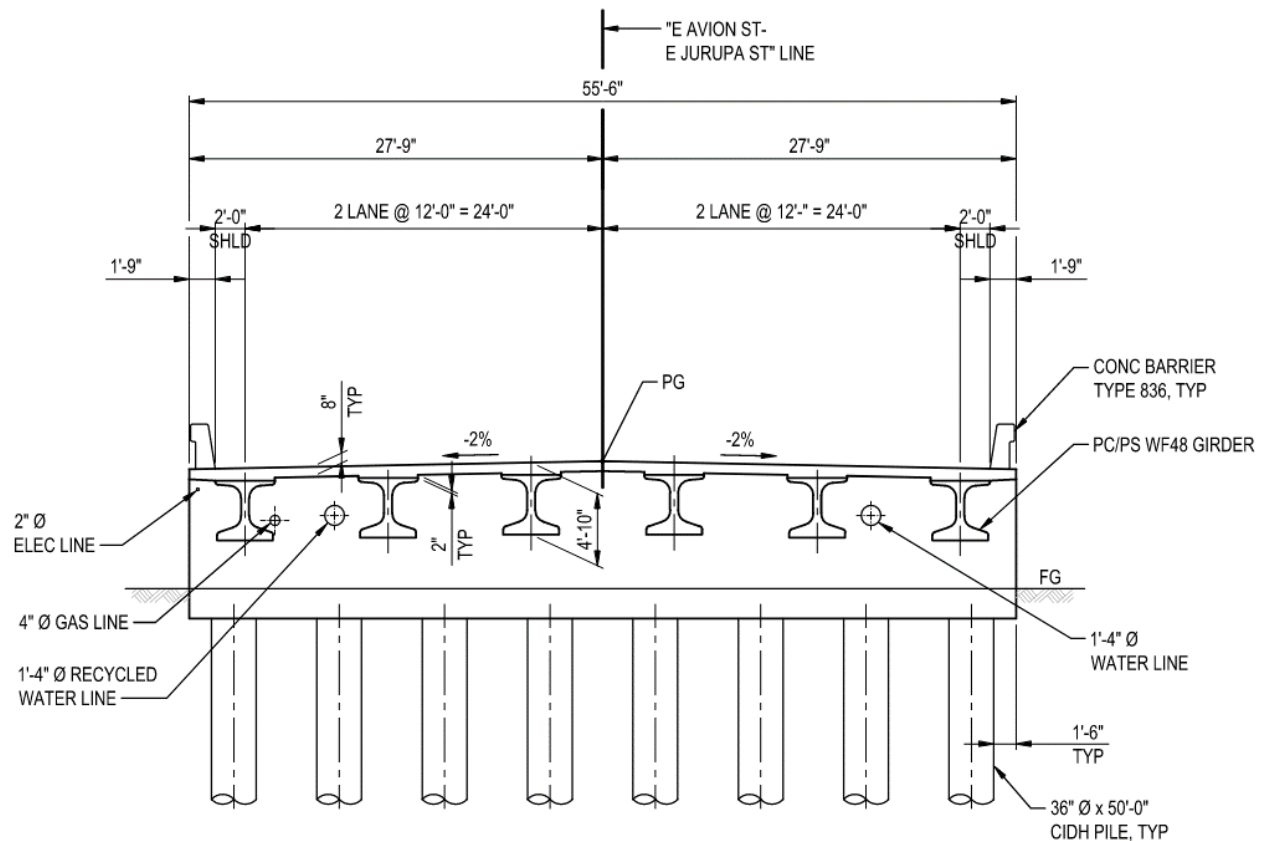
Typical section for the proposed Cucamonga Channel Bridge.
